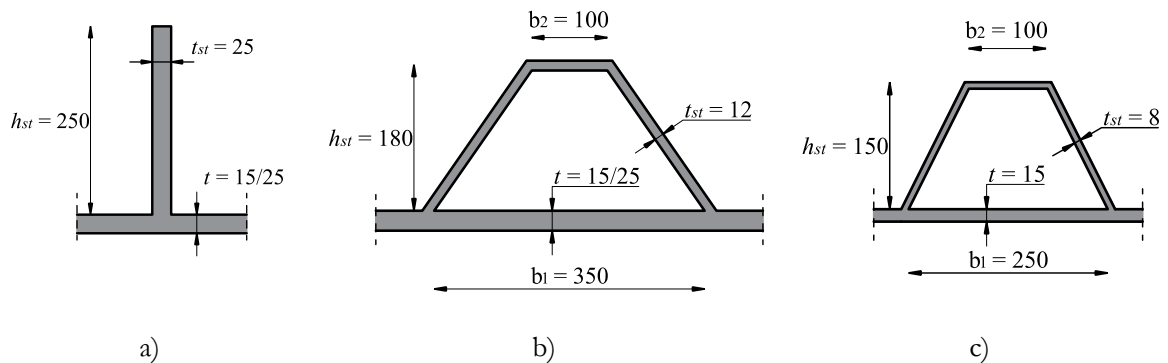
Stiffener typologies: a) flat; b) trapezoidal– Type 1 and c) trapezoidal – Type 2
